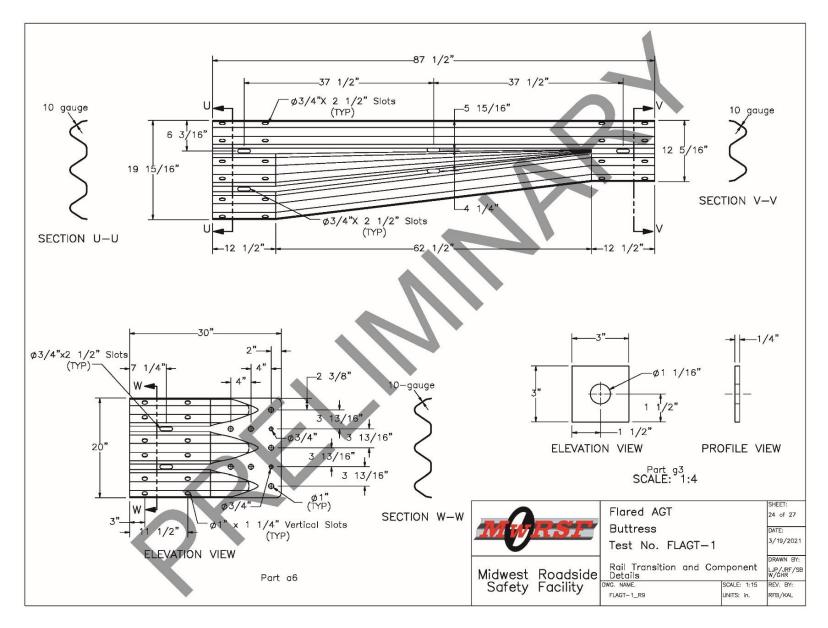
Rail Transition and Component Details, Test No. FLAGT-1
